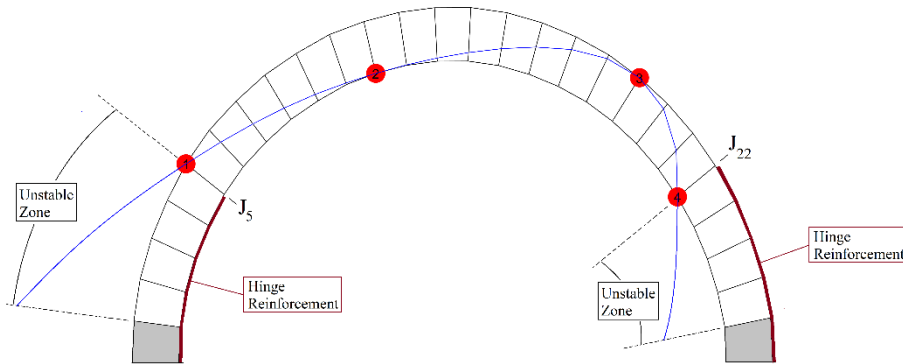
Reinforcement layout for maximum capacity of the in-scale arch subjected to a tilting plane
